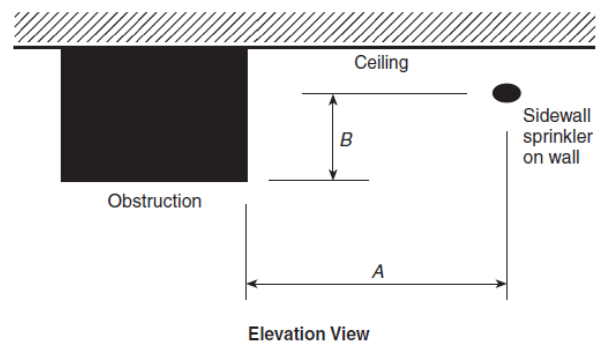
Positioning of Sprinklers to Avoid Obstructions Along the Wall (Extended Coverage Sidewall Spray Sprinklers).
